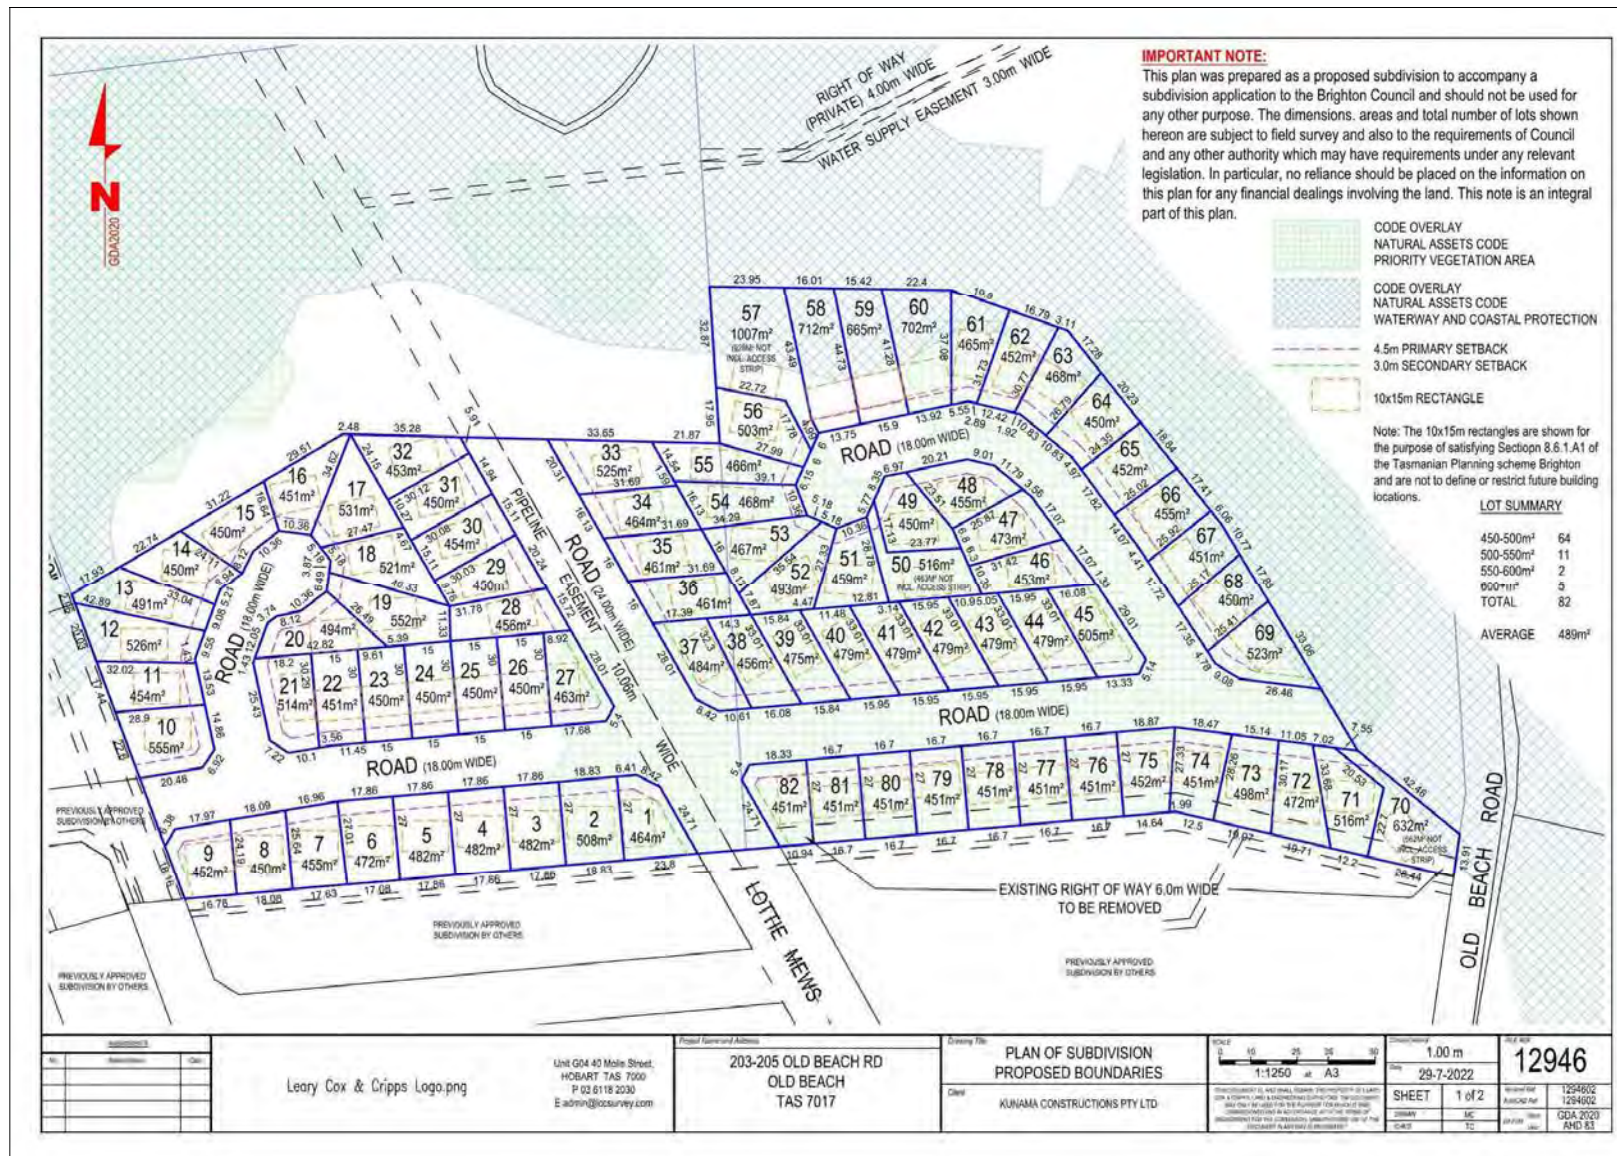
Proposed subdivision plan for 203 and 205 Old Beach Road, Old Beach
